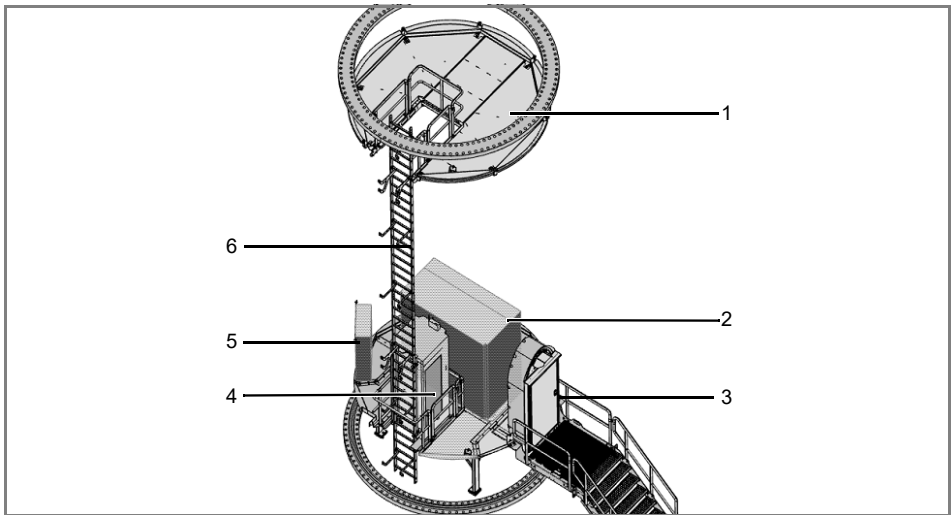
Overview of installations in the bottom section of the steel tube tower
